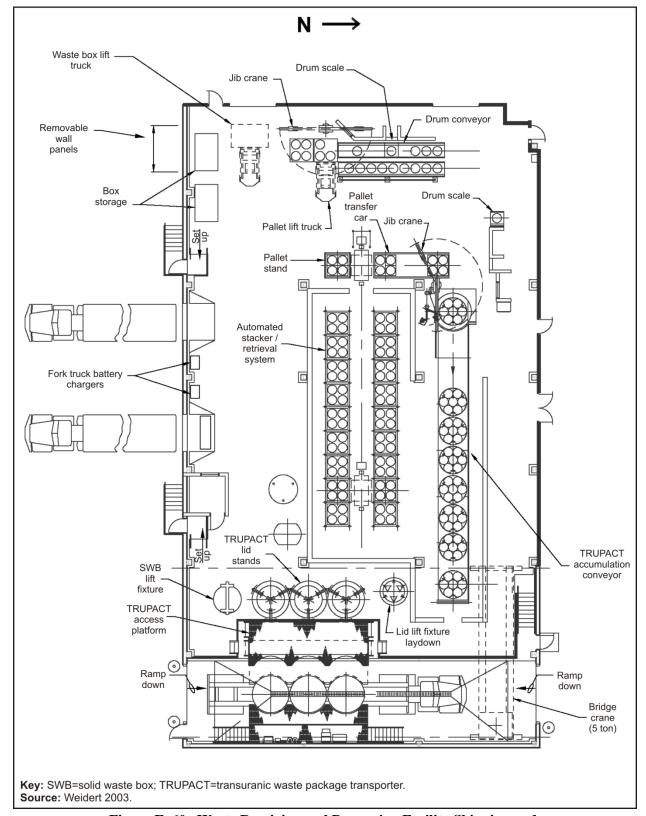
Waste Receiving and Processing Facility Shipping and Receiving Area Floor Plan and Equipment Layout
